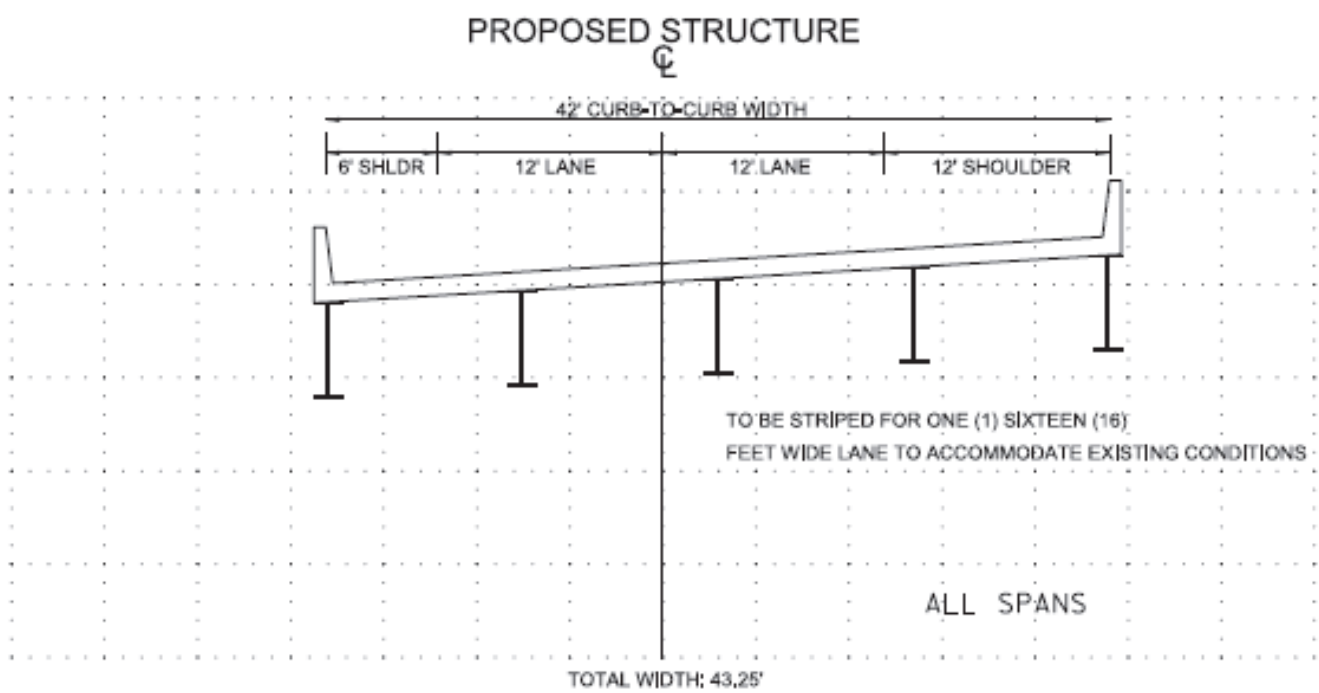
Depiction of proposed typical section (Bridge ID: 79I00550055), from TIR (01/05/2021)
